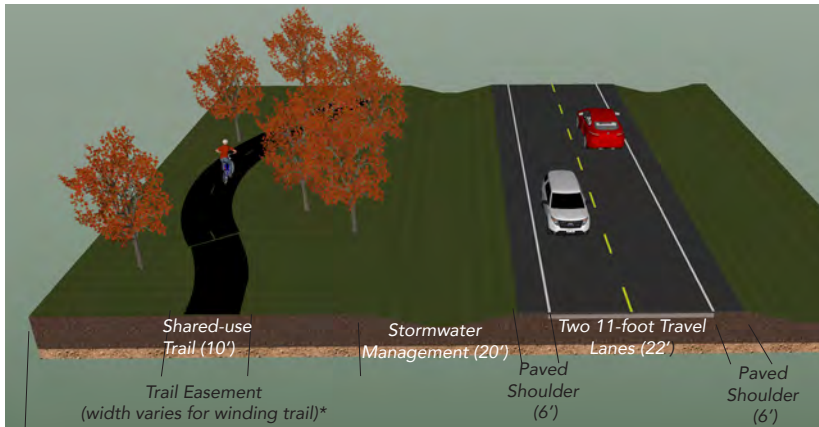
Typical section for segments of New Road where open drainage will remain (west of Canary Creek). Dimensions shown are for typical conditions but specific constraints such as wetlands, impact to adjoining properties, preservation of existing drainage or stormwater facilities, or other natural and cultural resource preservation may require narrower pavement widths, alternative drainage practices, or a narrower trail section. Meandering trail as shown requires cooperation with developer. Shallower curves are applicable where constraints limit trail corridor.
